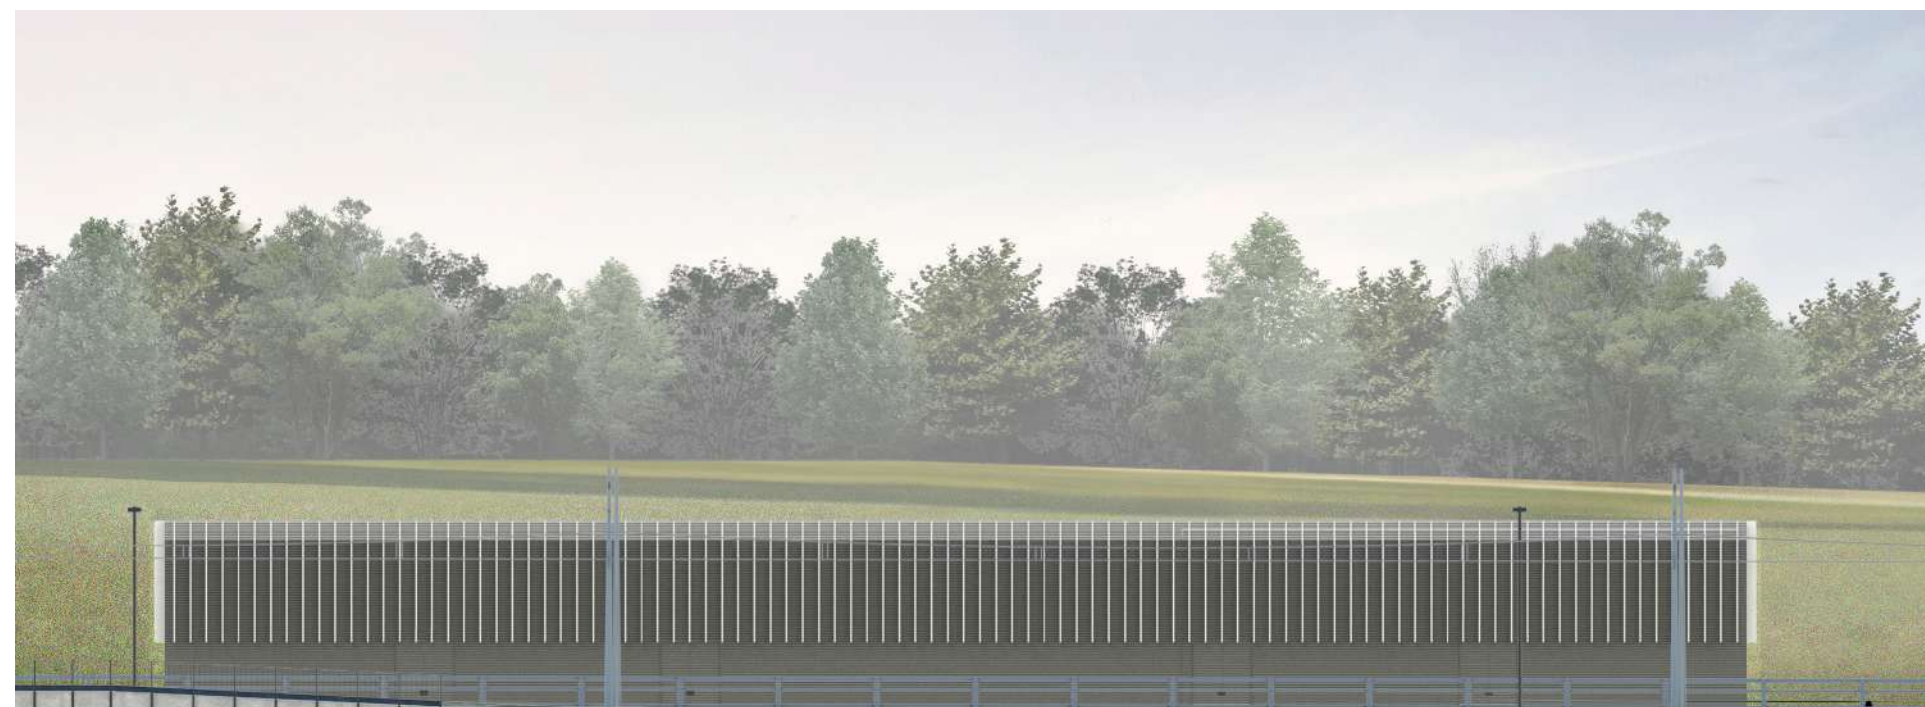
\_Visualisation - Proposed south-west elevation - Compound building
